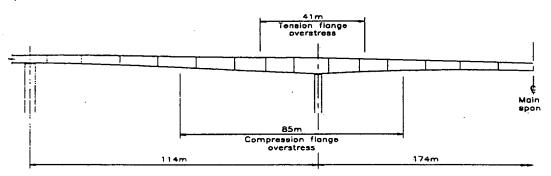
Friarton Bridge, showing area of overstress (87).
